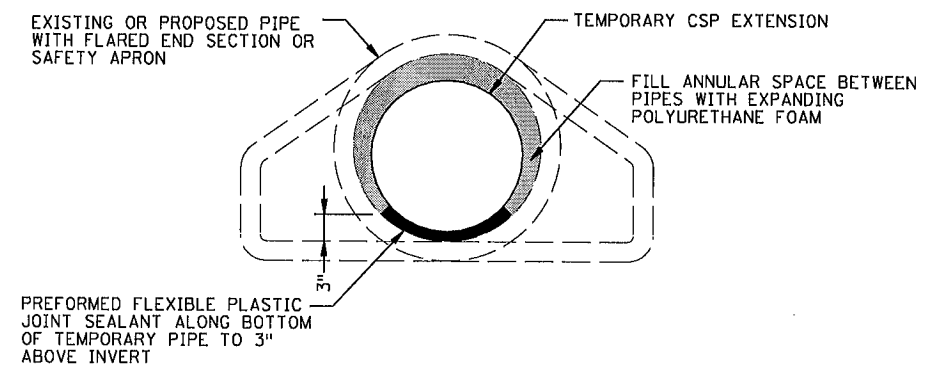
DETAIL OF CONNECTION OF CASIED PIPE TO STRUCTURE
